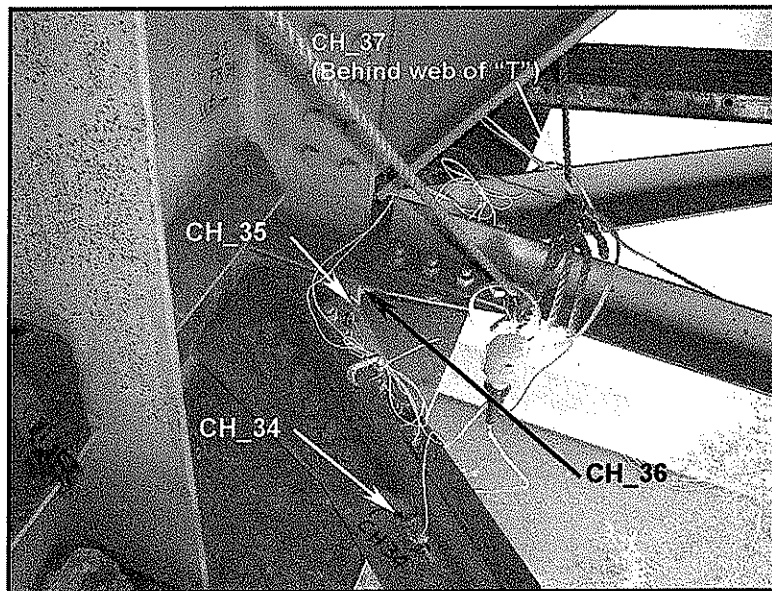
Photograph of gages CH_34, CH_35, CH_36, and CH_37 installed at floorbeam 34 of G3 in bay 2
